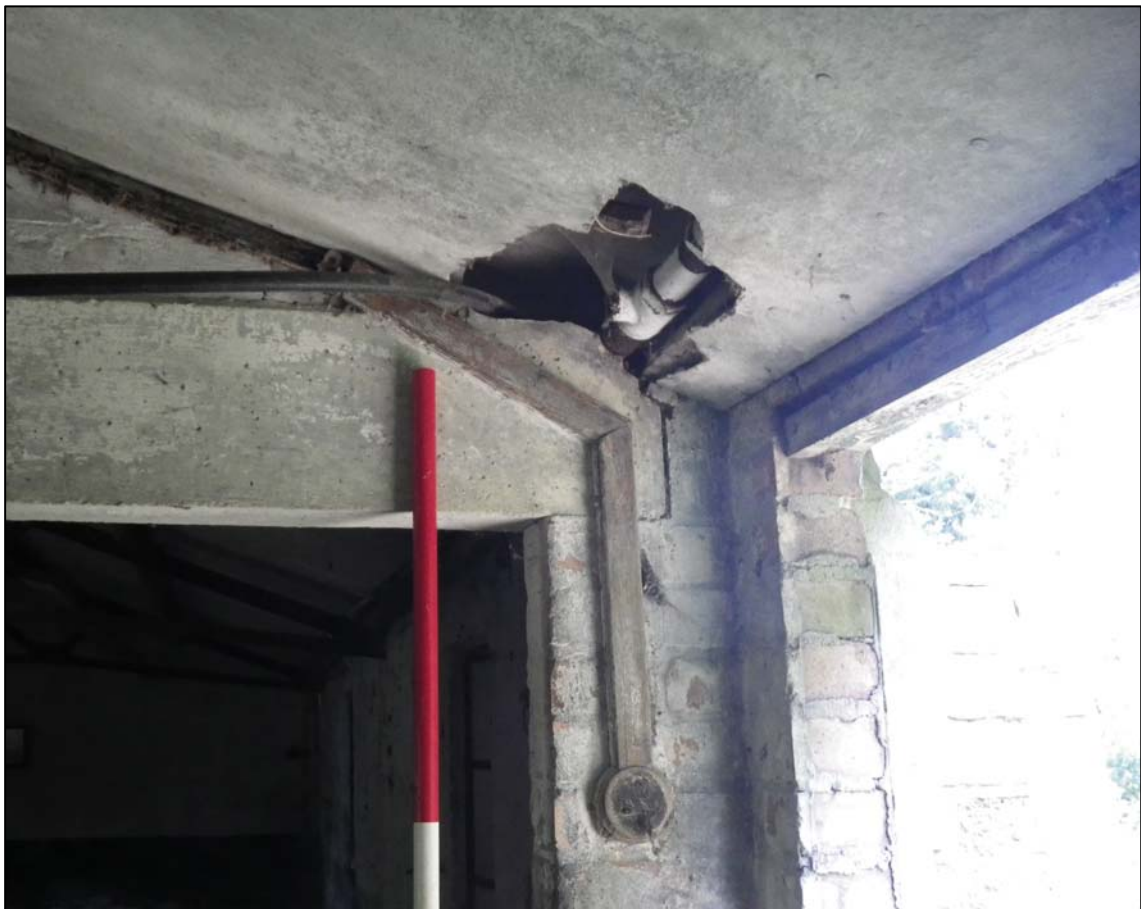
wooden backing and wiring duct - Building 1 (ref. HTQ 80)
